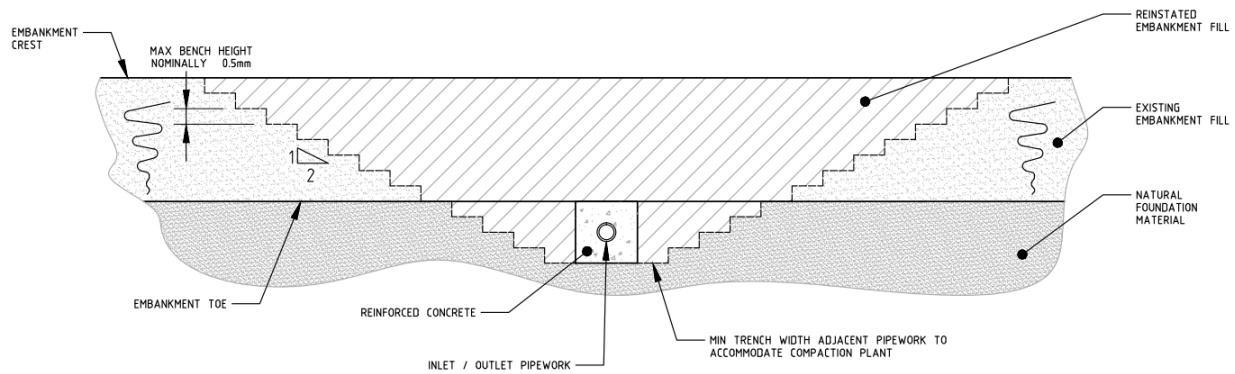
Example excavation through the embankment to replace inlet / outlet pipework
